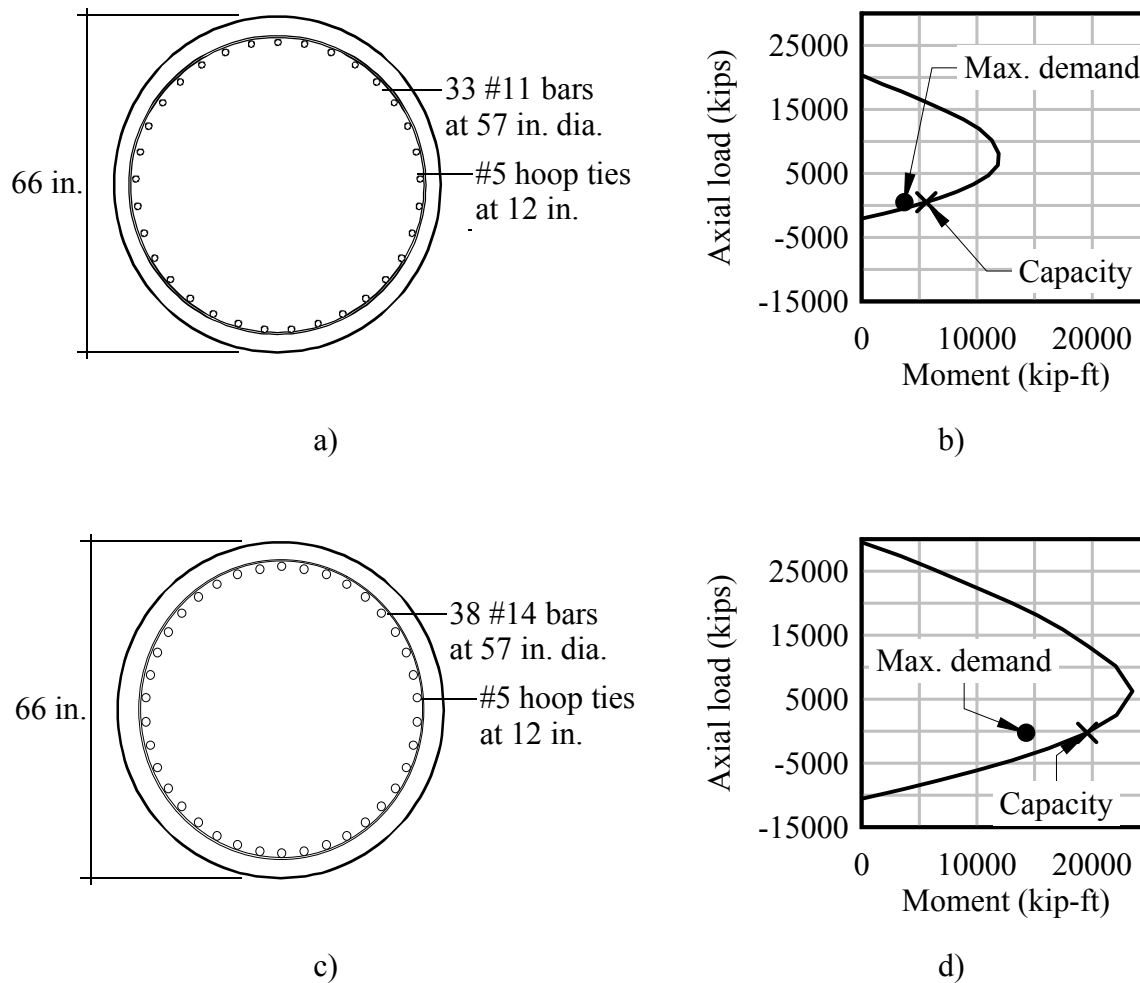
Original versus strengthened column cross-section summary for the SR-20 at Blountstown Pier 58 case. a) Original column cross-section; b) Load-moment interaction for original cross-section in response to AASHTO static load; c) Strengthened column cross-section; d) Load-moment interaction for strengthened cross-section in response to dynamic load
